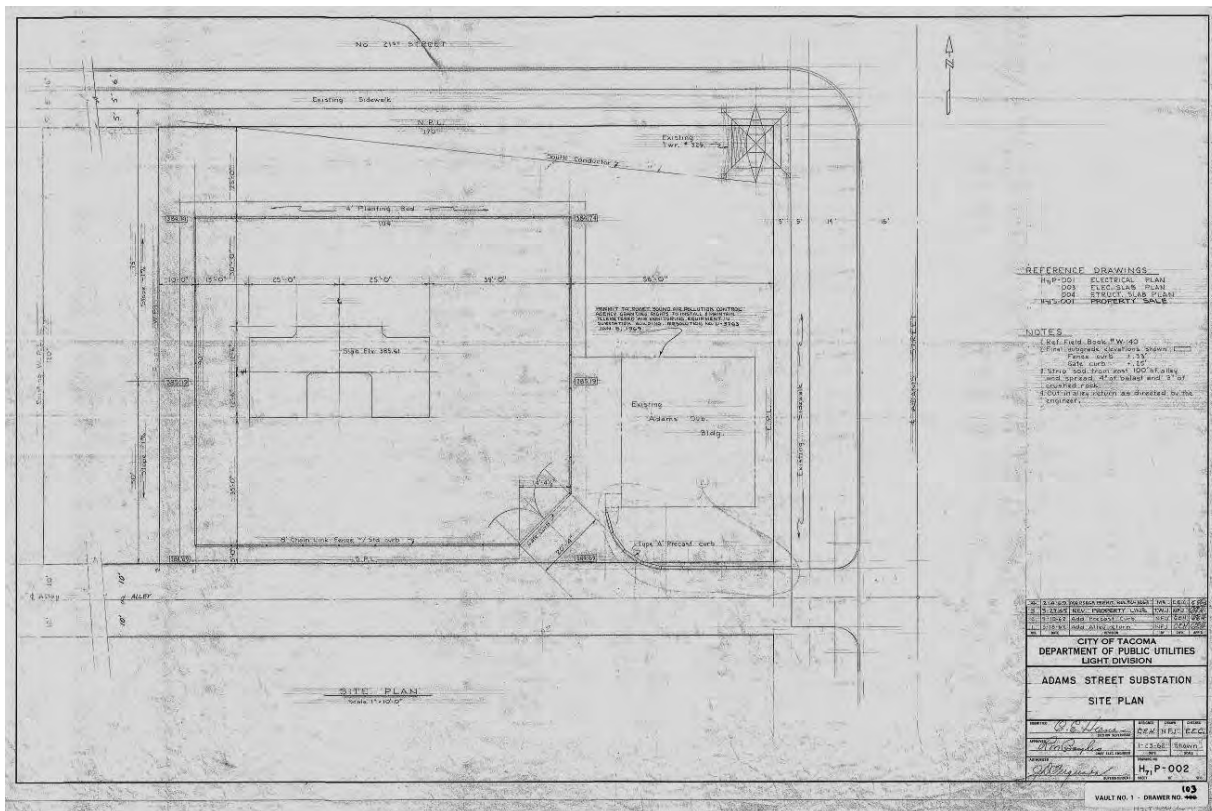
Adams St. Substation, site plan, 1968. Courtesy of Tacoma Power.
